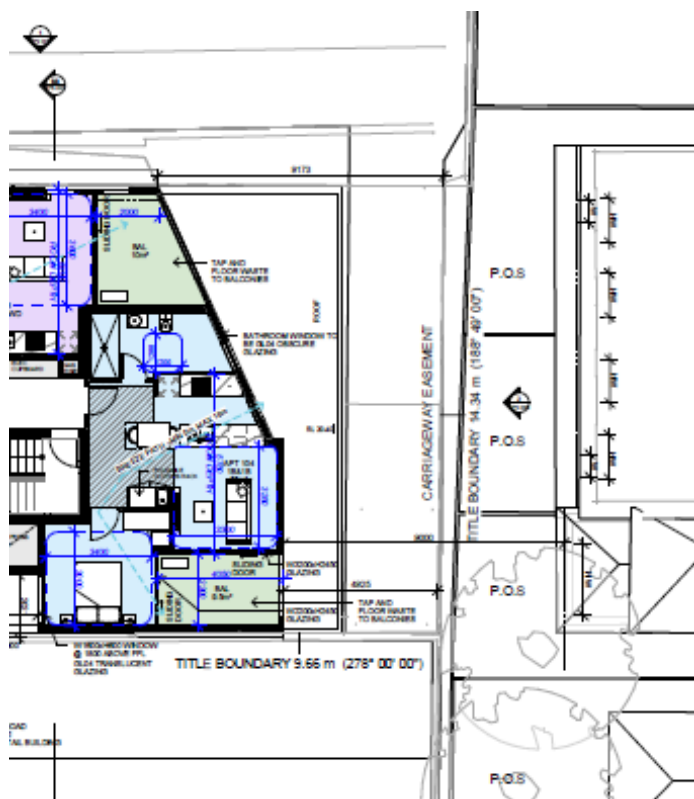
proposed setbacks at first floor to rear boundary and habitable room windows of adjoining dwellings.
